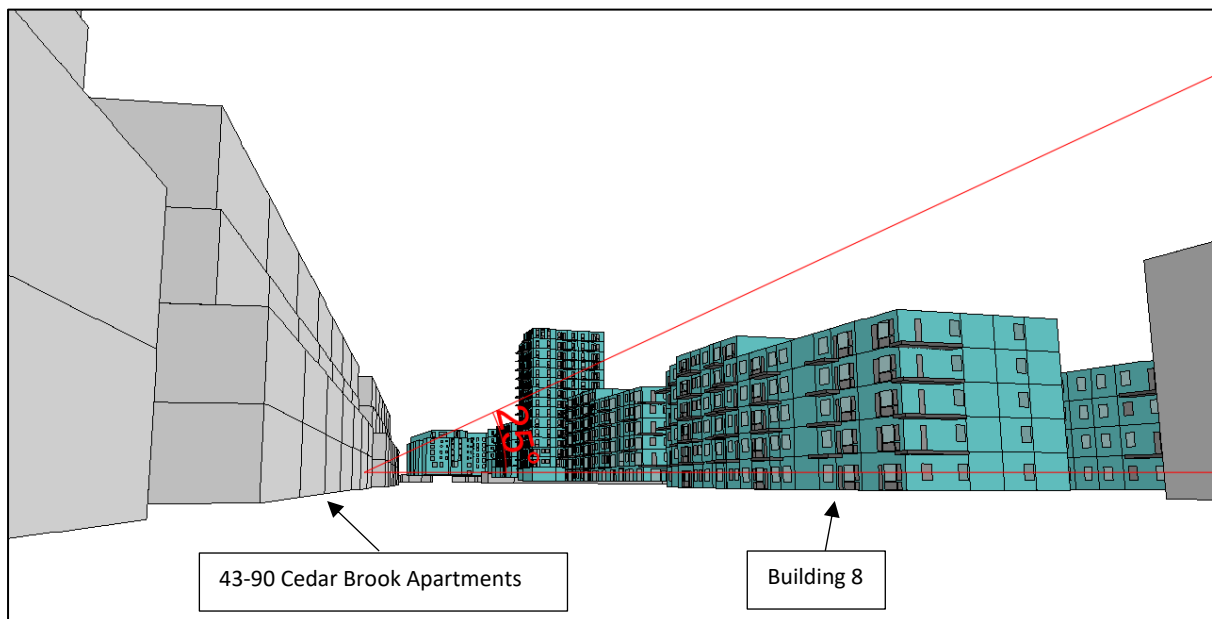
Section in plane perpendicular to the affected window wall of Cedar Brook Avenue (43-90) facing southeast
